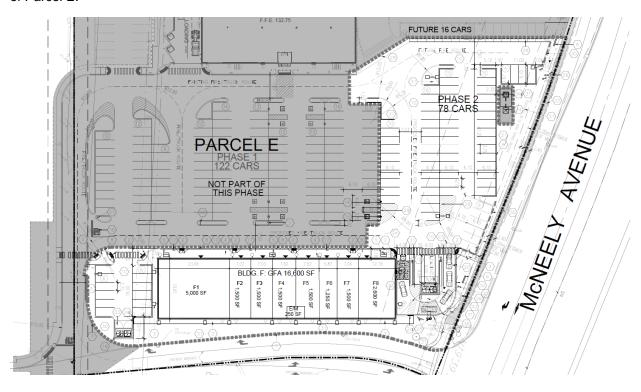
Site Plan excerpt (Petroff Partnership Architects)
